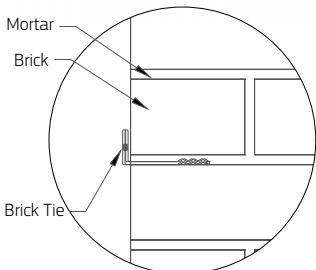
Builder Plans for 110mm Rendered Brick, Brick Tie
